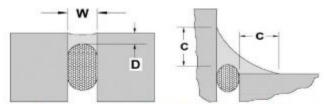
Non-structural sealant bead width and depth recommendations and appropriate joint design
